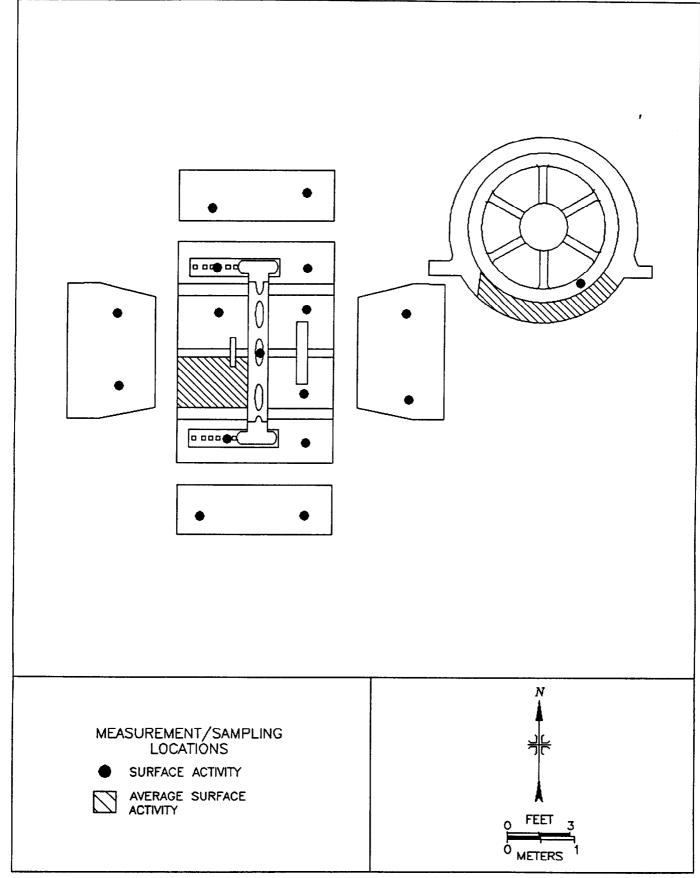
Building 8, West Compressor Pit — Measurement and Sampling Locations
